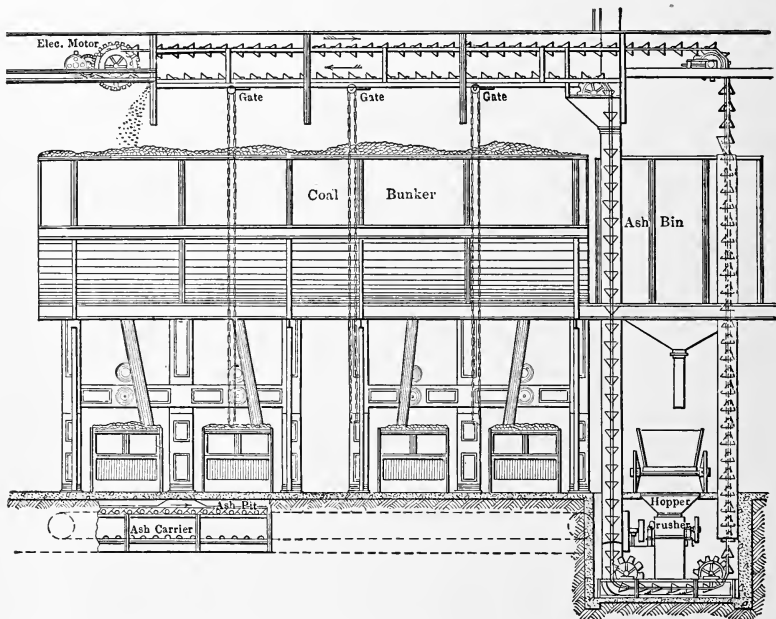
Typical Installation of V-Bucket Conveyor for Handling Coal and Cast-iron Pan Conveyor for Handling Ashes.
